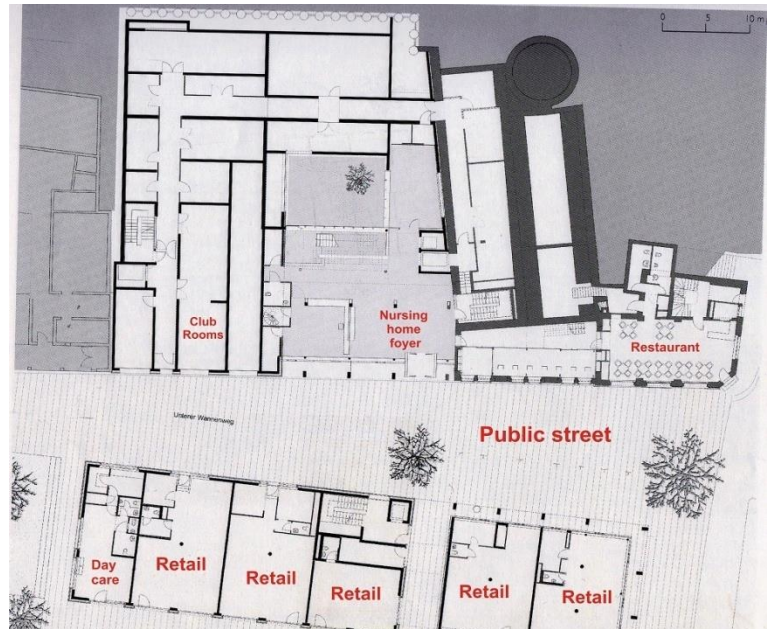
The ground floor plan. (Adapted from Mostaedi, 2003: 154)
